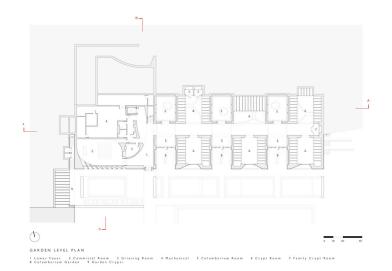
| LAKEWOOD FLOOR PLAN LOWER | HGA ARCHITECTS
